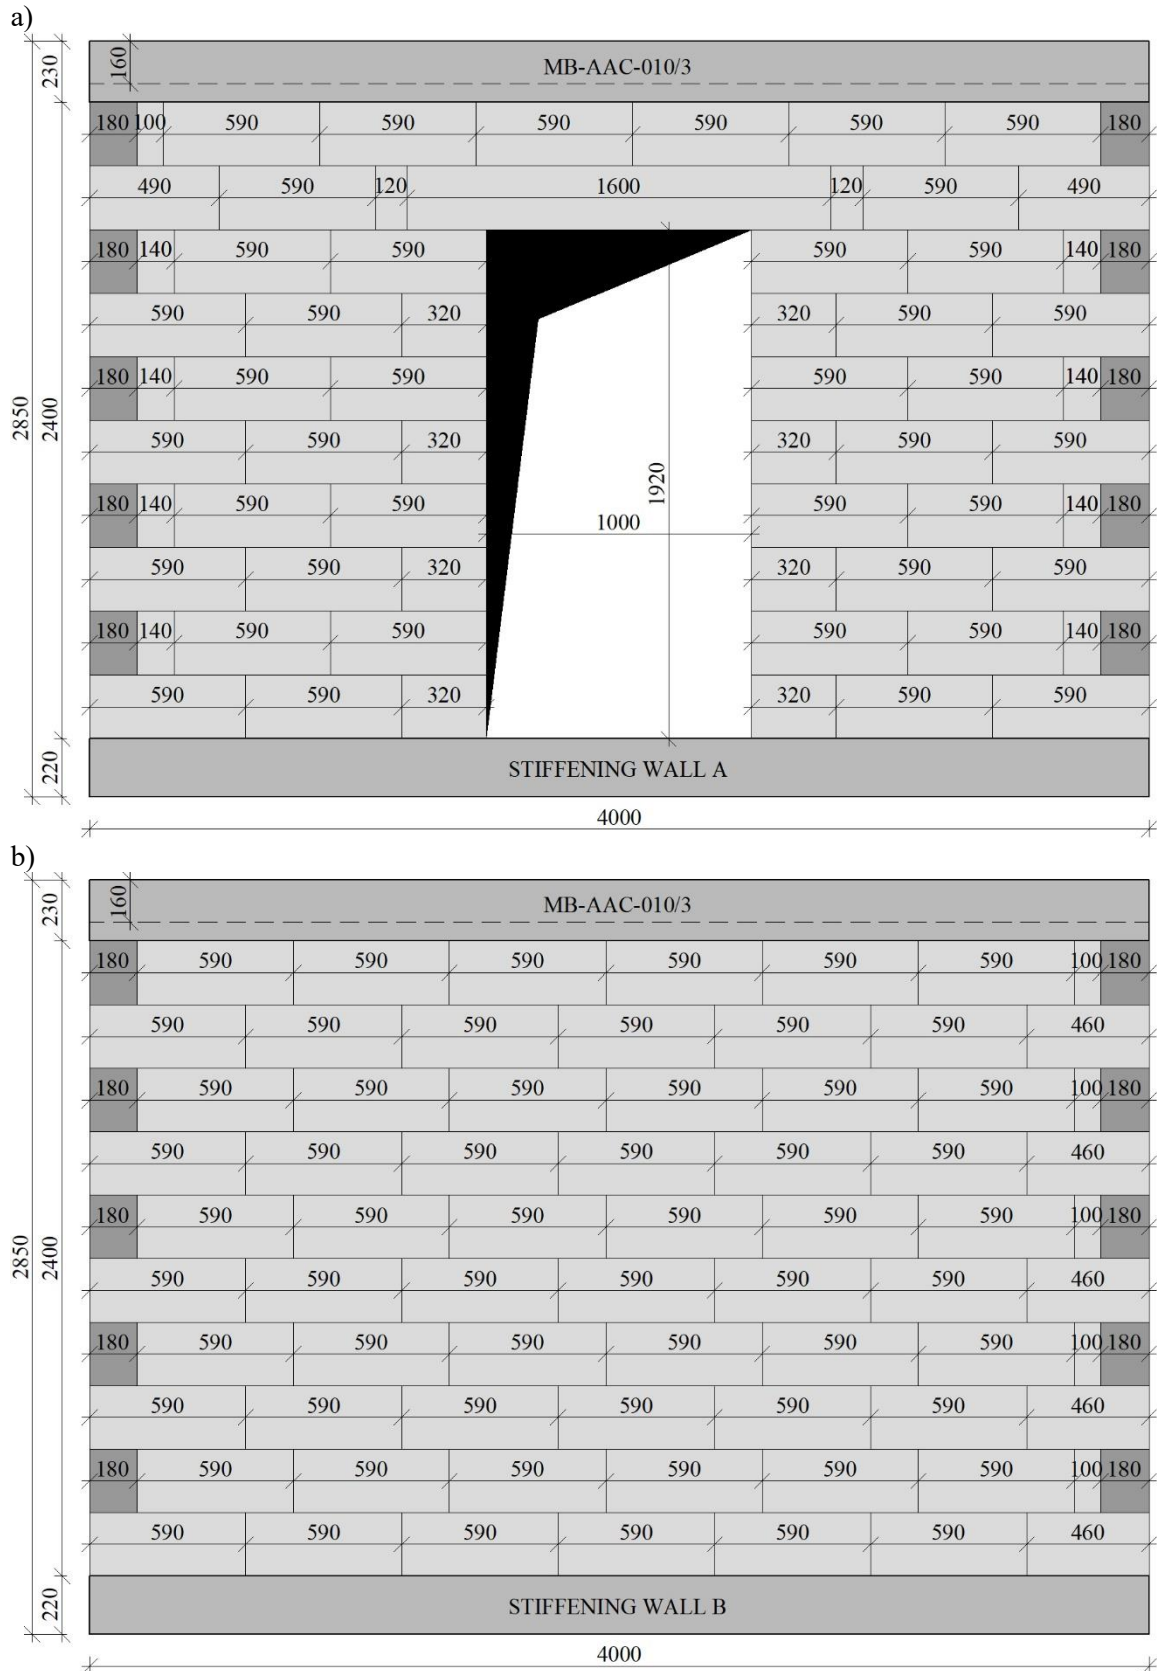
Design of the MB-AAC-010/3 model: a) stiffening wall A, b) stiffening wall B
